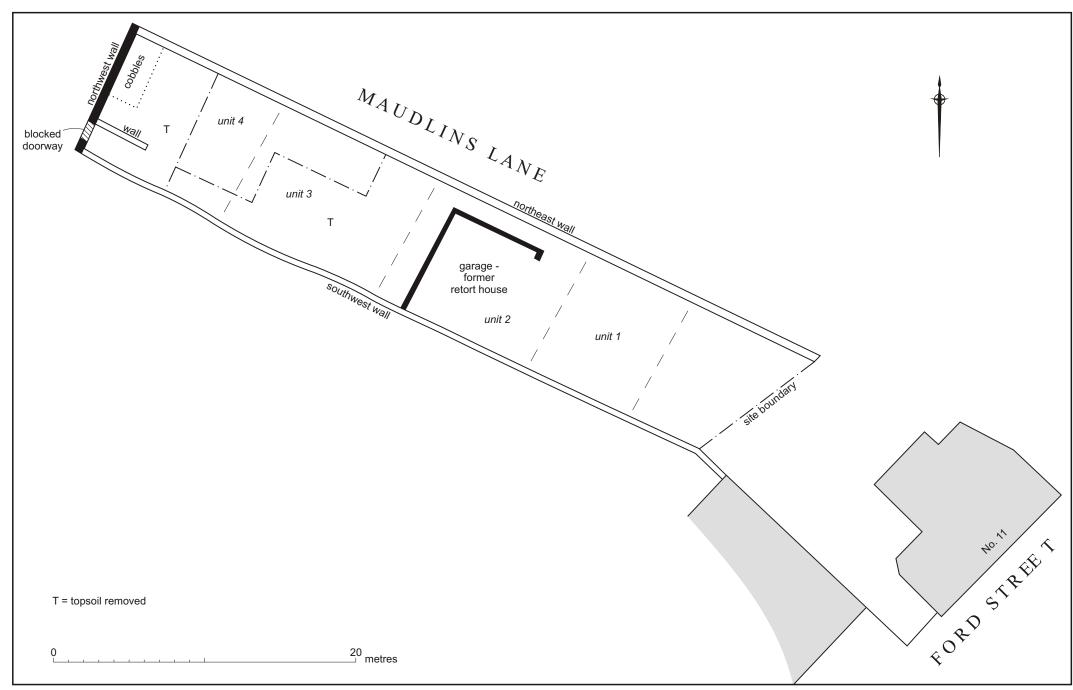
Ground plan to rear of No. 11 Ford Street, Tavistock.
